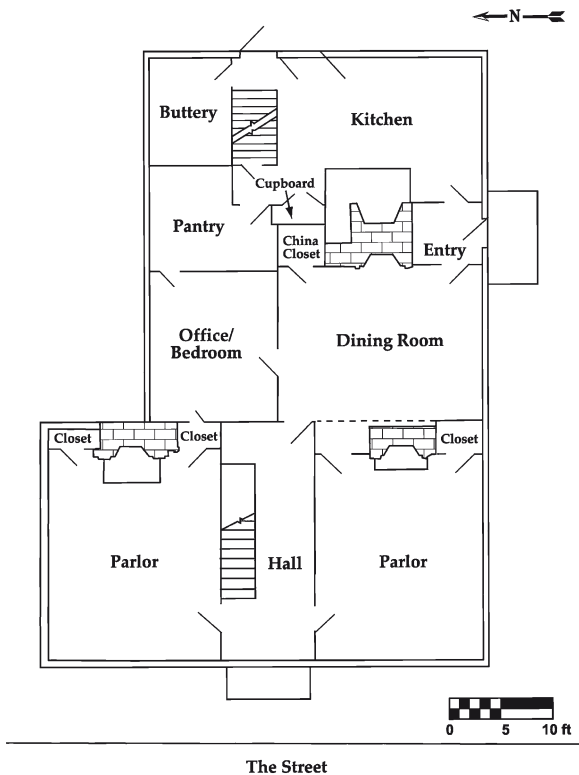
Floor plan of the first floor of the Ebenezer Hinsdale and Anna Williams house (ca. 1816). Created by Kit Curran for the author
